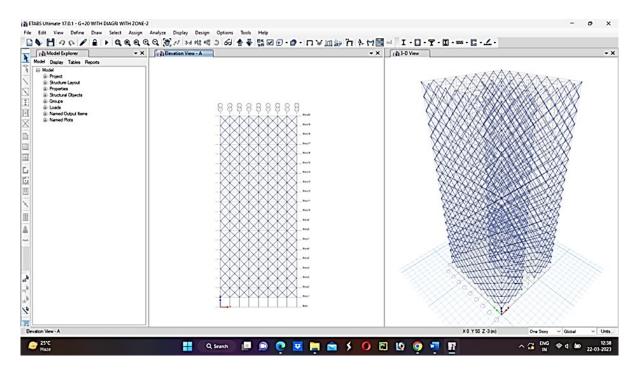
Elevation and 3D view of G+19 Diagrid Building
